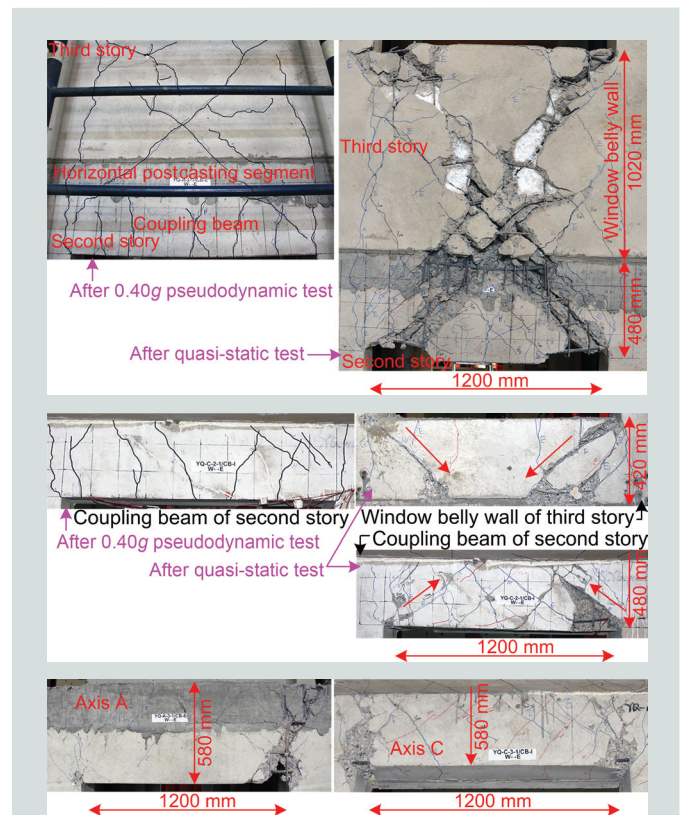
Failure modes of coupling beams and window belly walls. Note: g = acceleration due to gravity. 1 mm = 0.0394 in.
